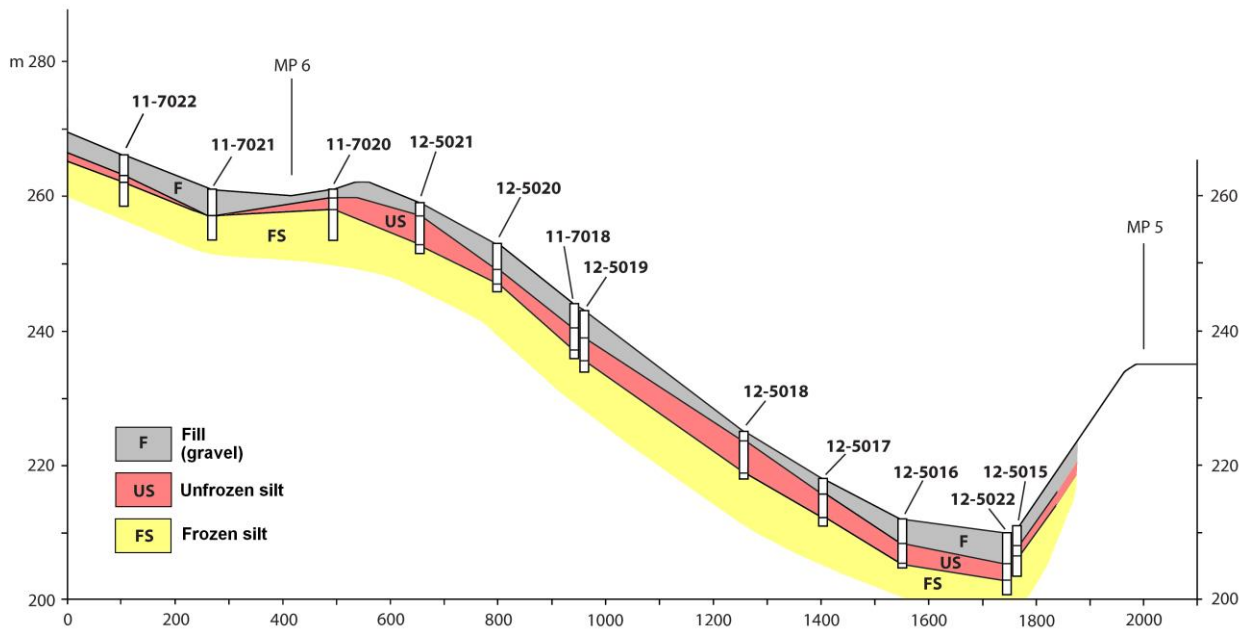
Cross section #2, Goldstream Road, Miles 5 to 7
